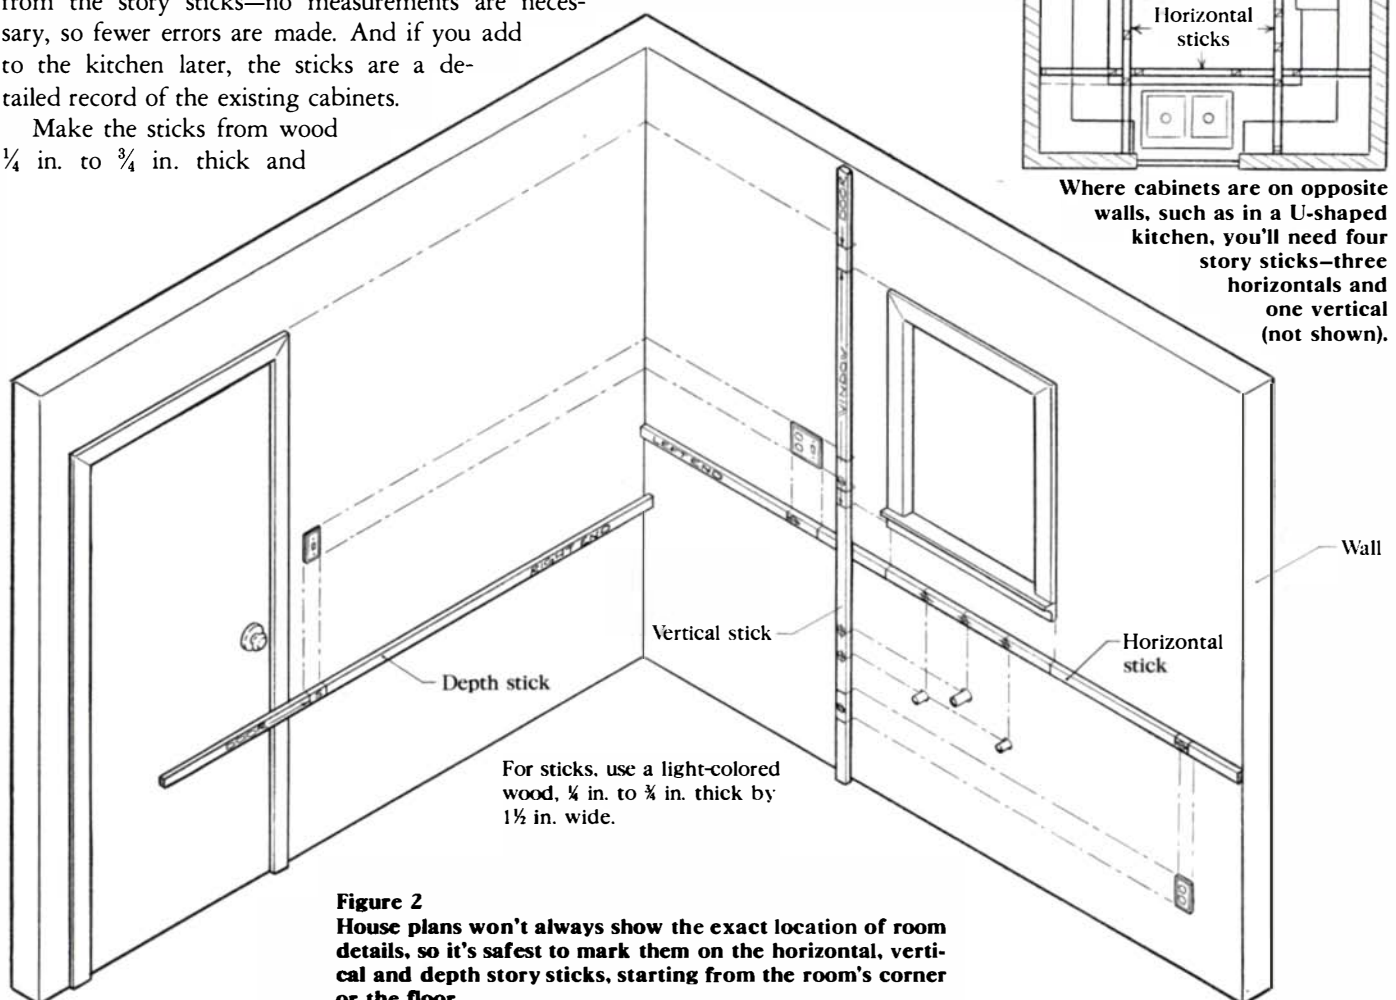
House plans won't always show the exact location of room details, so it's safest to mark them on the horizontal, vertical and depth story sticks, starting from the room's corner or the floor.
